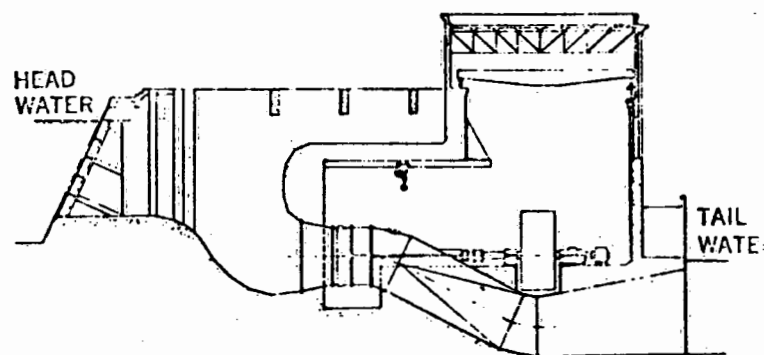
Powerhouse cross-section view with new TUBE turbine.
